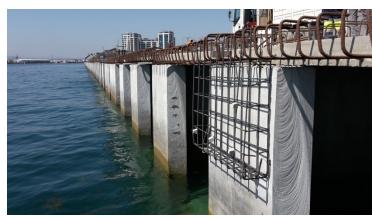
Dock construction with NOWAVES technology, exterior windows and superstructure
